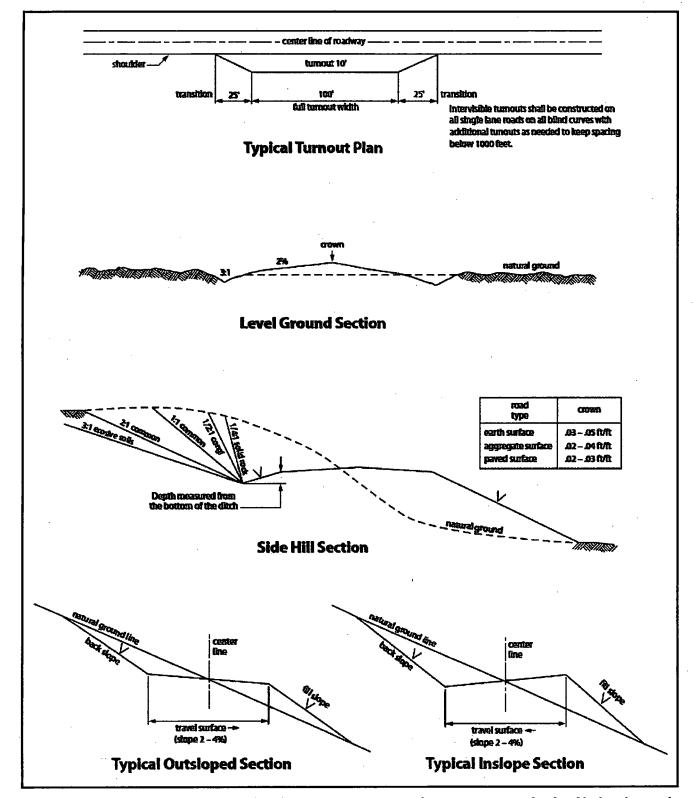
Cross-sections and plans for typical road sections representative of BLM resource or FS local and higher-class roads.
